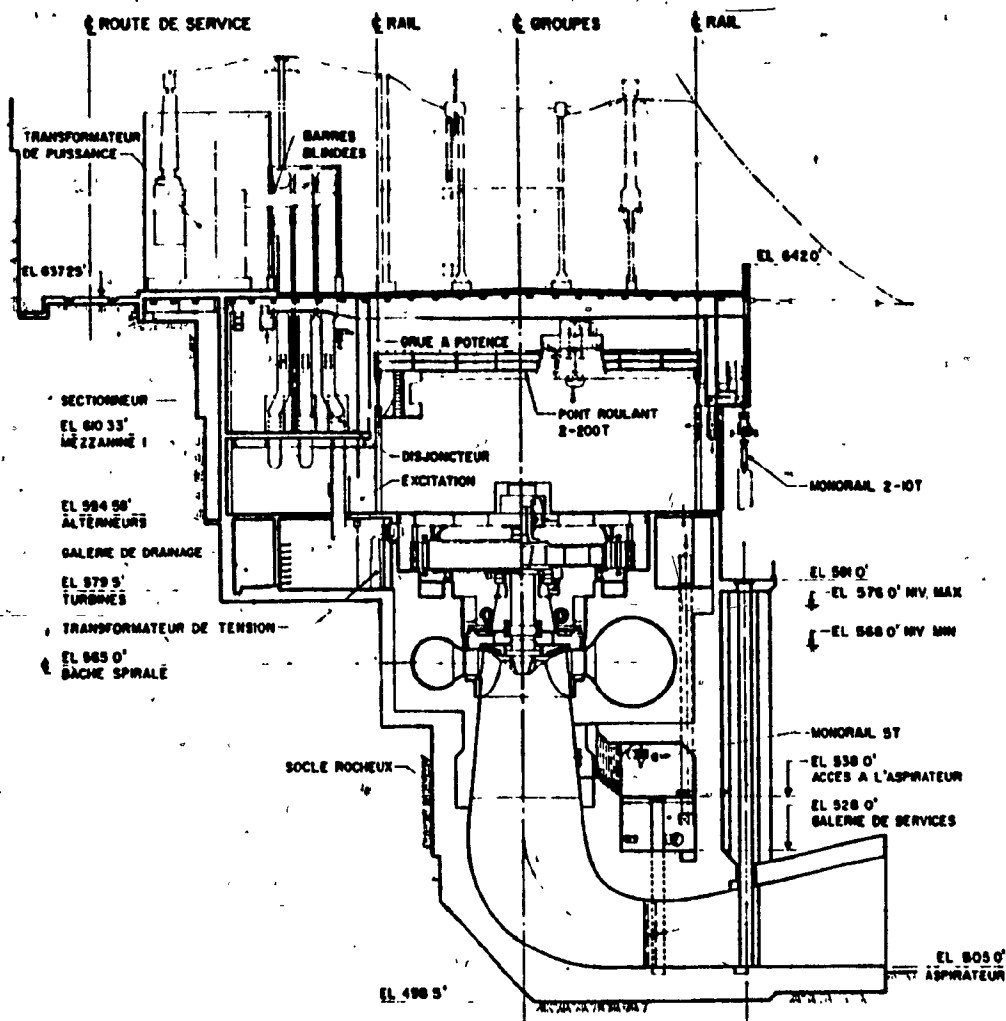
LG-3 Powerhouse, Cross-Section.
